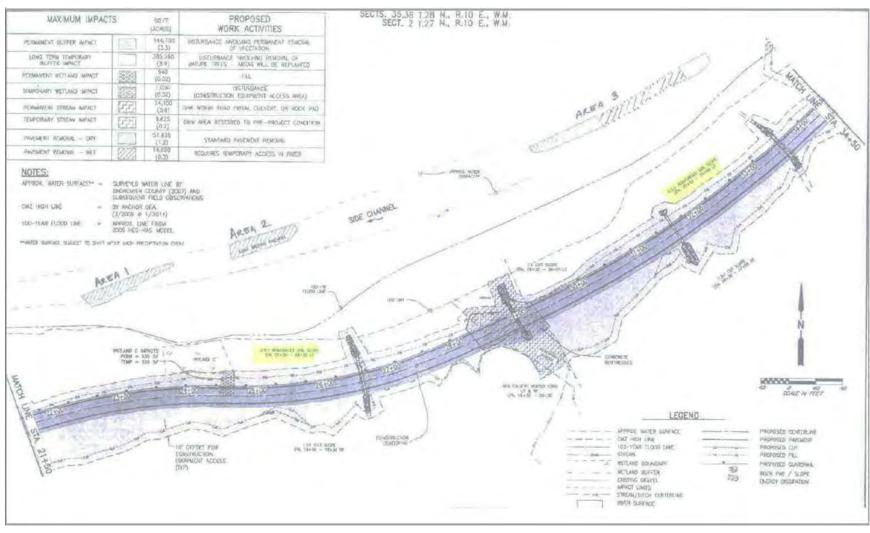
Roadway section plan sheet with details, including constructed reinforced soil slopes (Snohomish County Public Works 2015, Appendix D)
